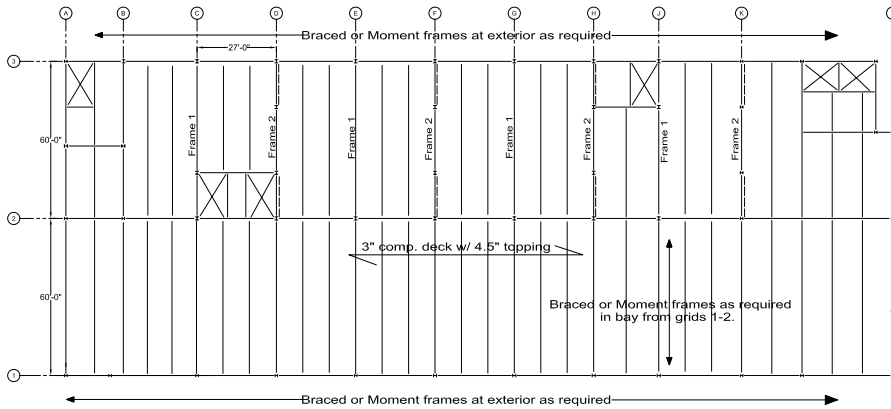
A typical staggered truss layout for parking levels in a mixed-use building.
